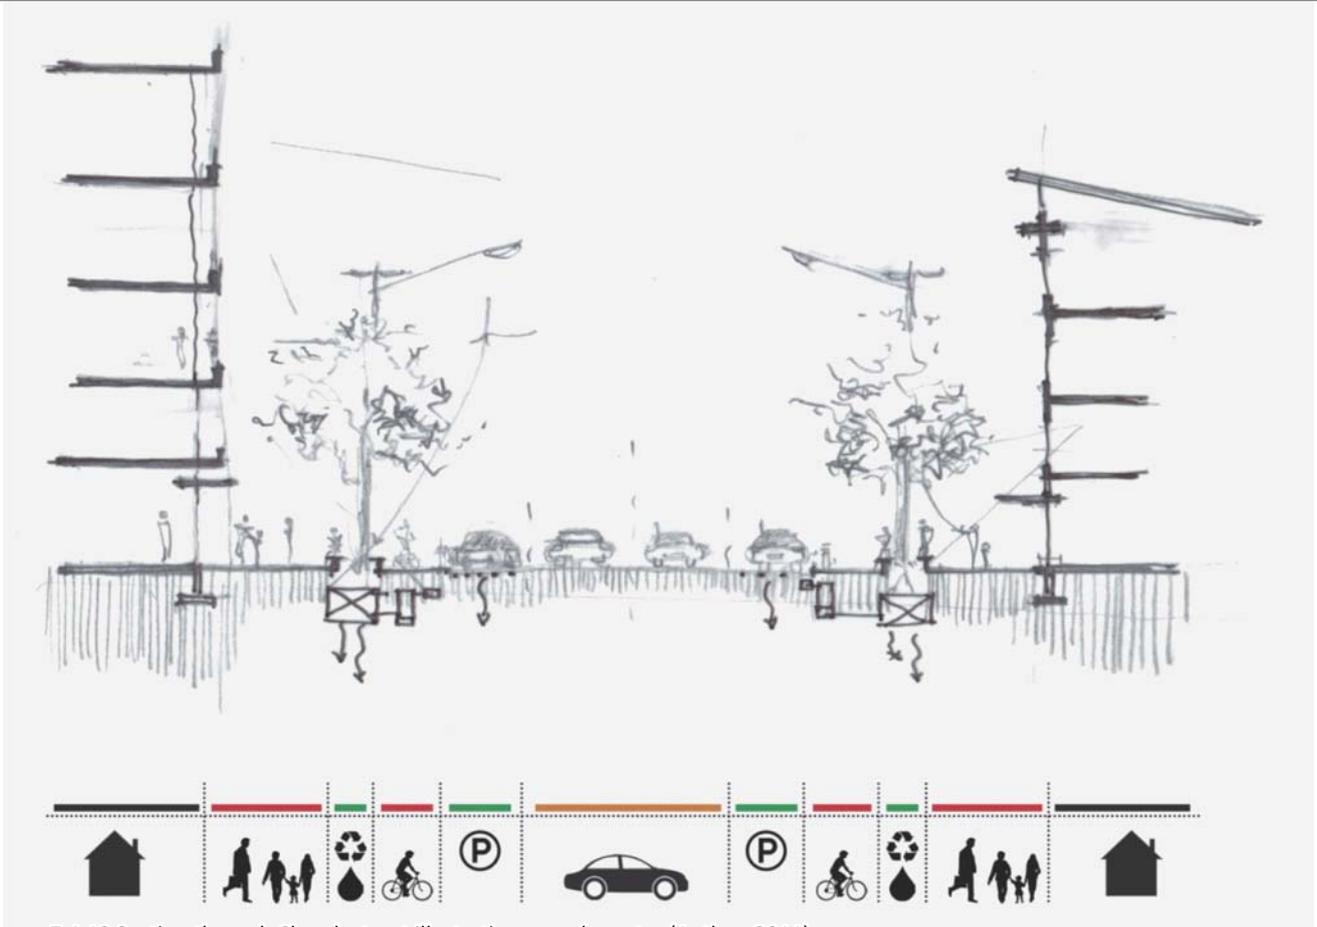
Section through Church street illustrating new character (Author, 2011).
